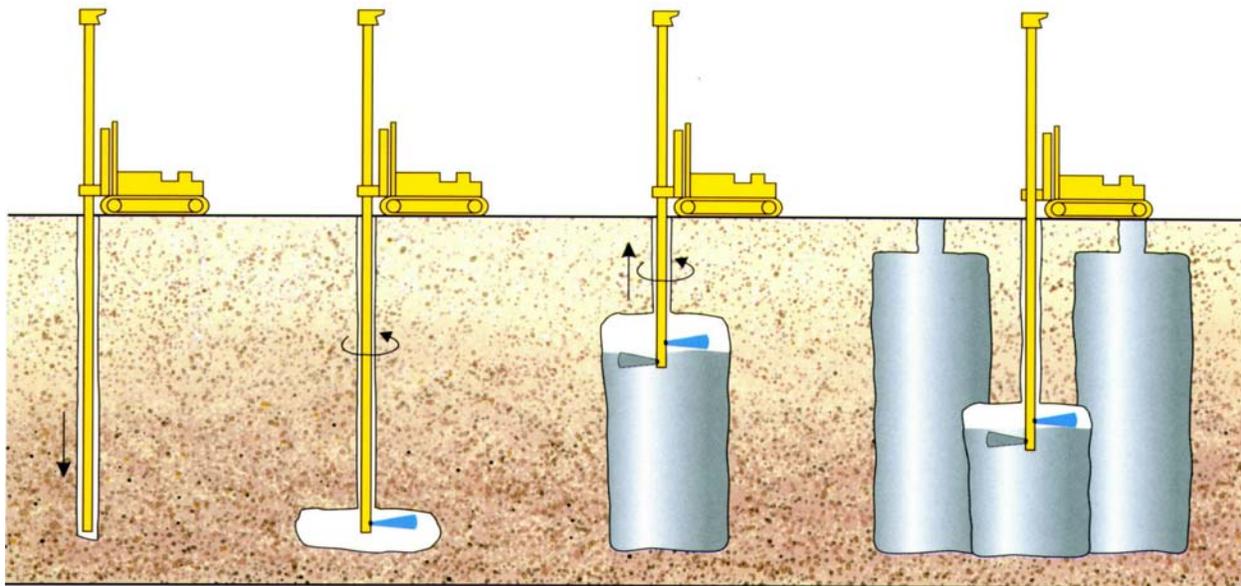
Schematic of Jet Grouting (from Hayward Baker)
